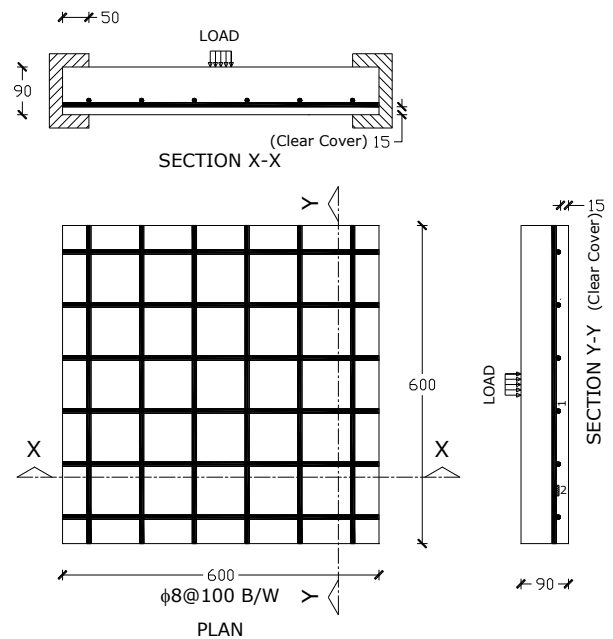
Reinforcement details of test slabs (All dimensions in mm).
